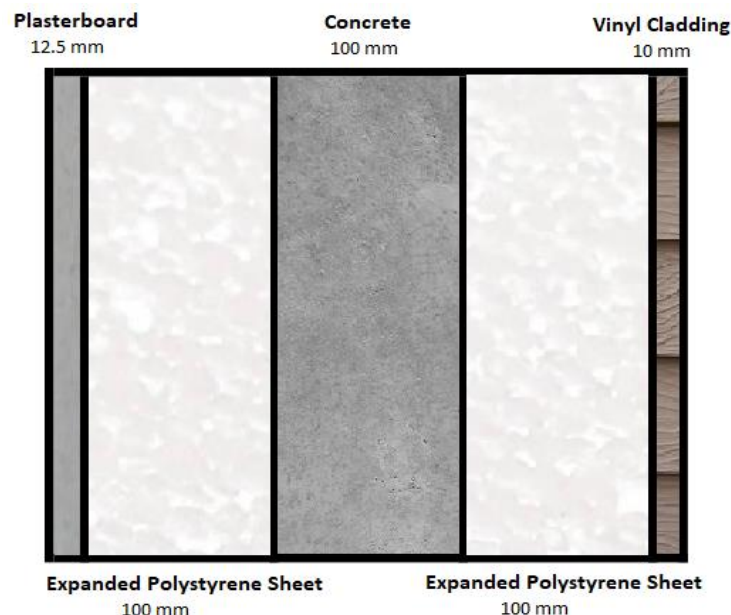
Cross section of the Insulated concrete form (ICF) wall System
